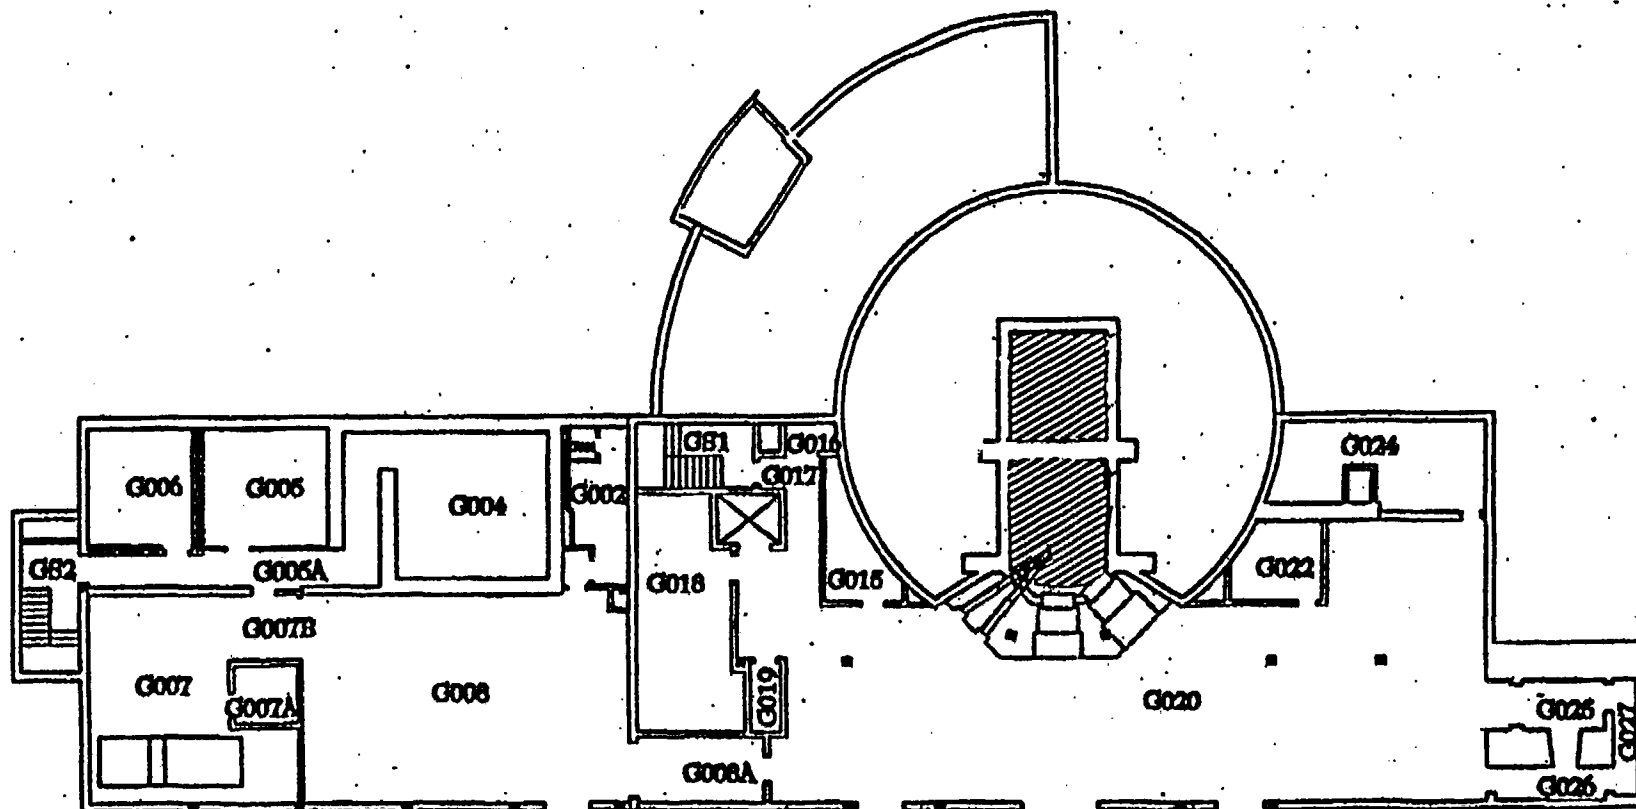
UVA Reactor Ground Floor Plan View Indicating the Location of the Soils Beneath the Reactor Pool.
